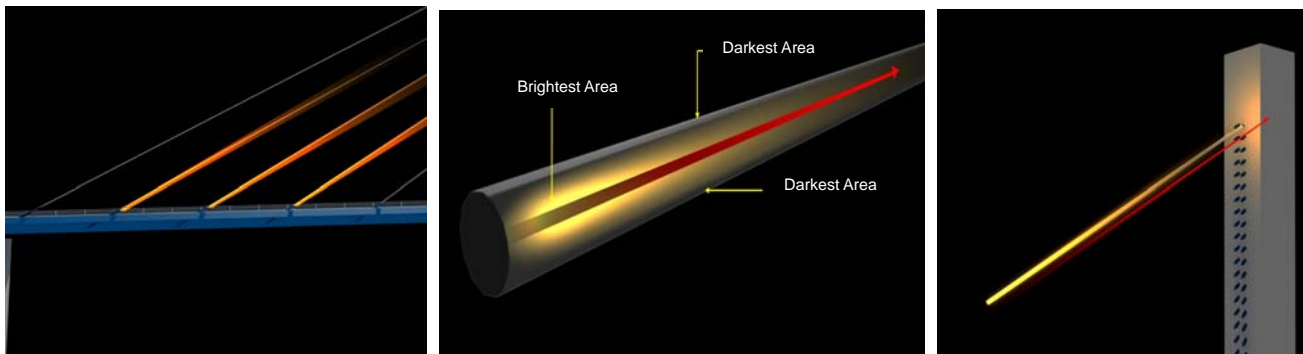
Flood Lighting Aiming at the Exterior of the Cables
